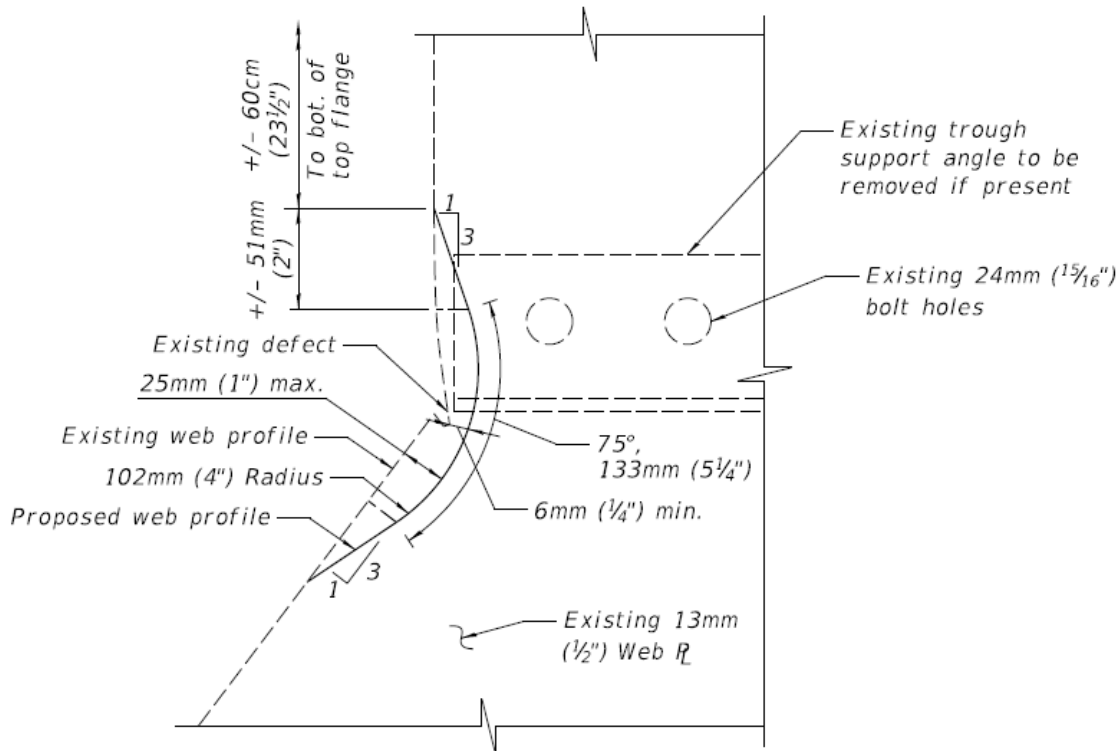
Final typical repair at web reprofiling (plate on opposite side not visible). (Courtesy of IDOT)
